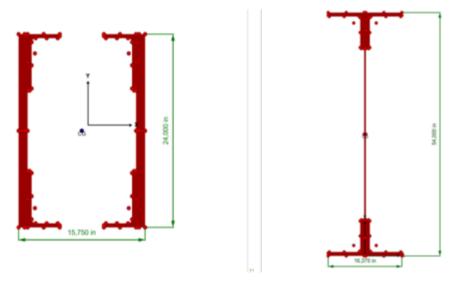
Cross Sections of the Truss Bottom-Chord (left) and Plate Girder (right)
